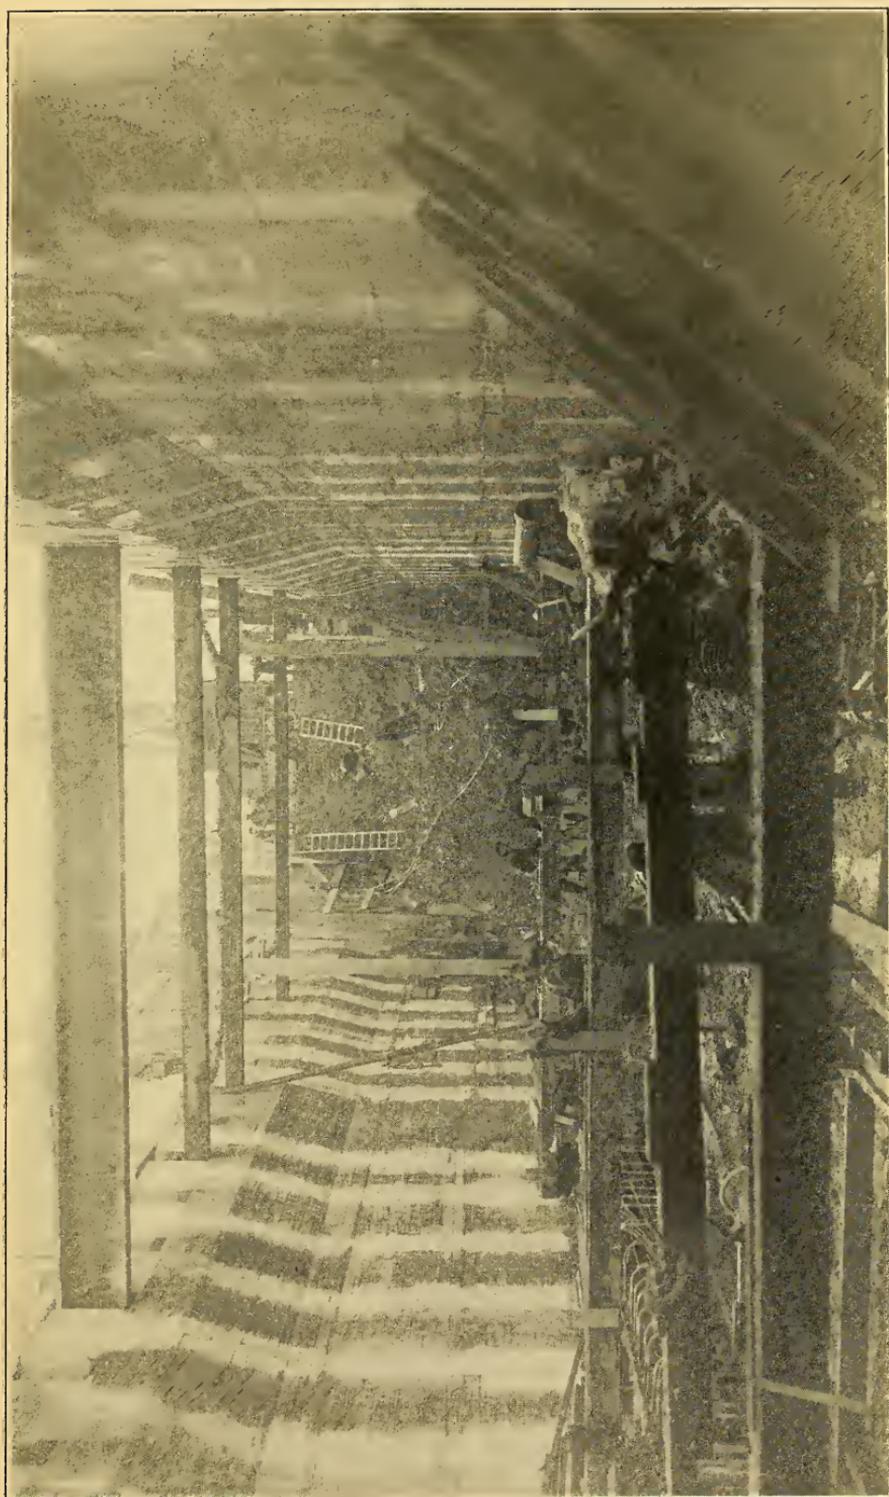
REMOVAL OF EARTH CORE BETWEEN COMPLETED SUBWAY WALLS — CHELSEA STREET
